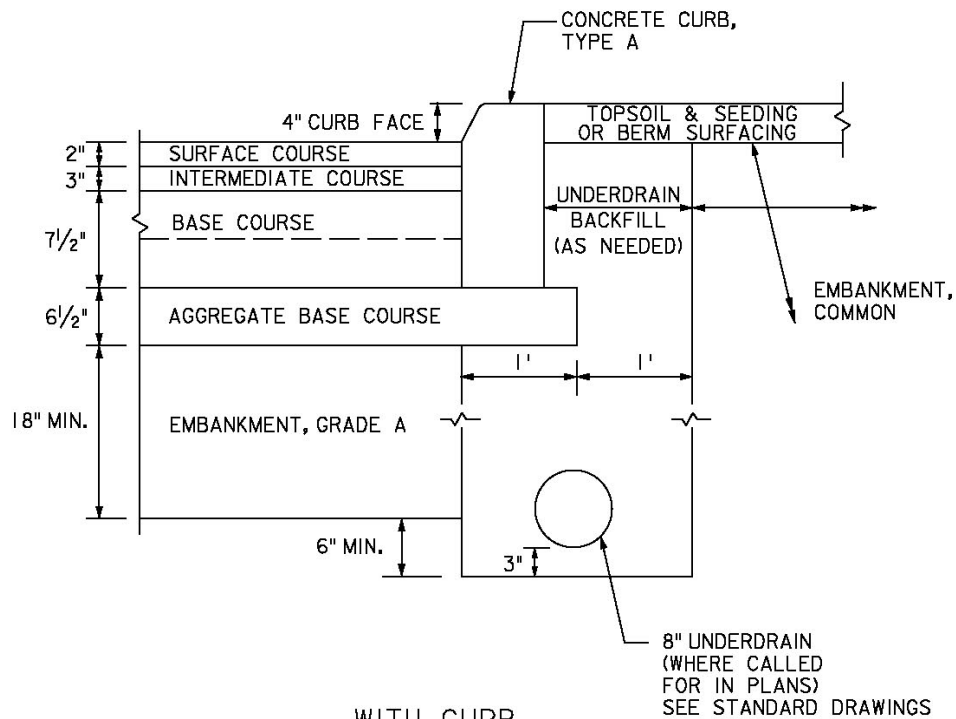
A - 11 LONGITUDINAL PAVEMENT STEPPING DETAIL
